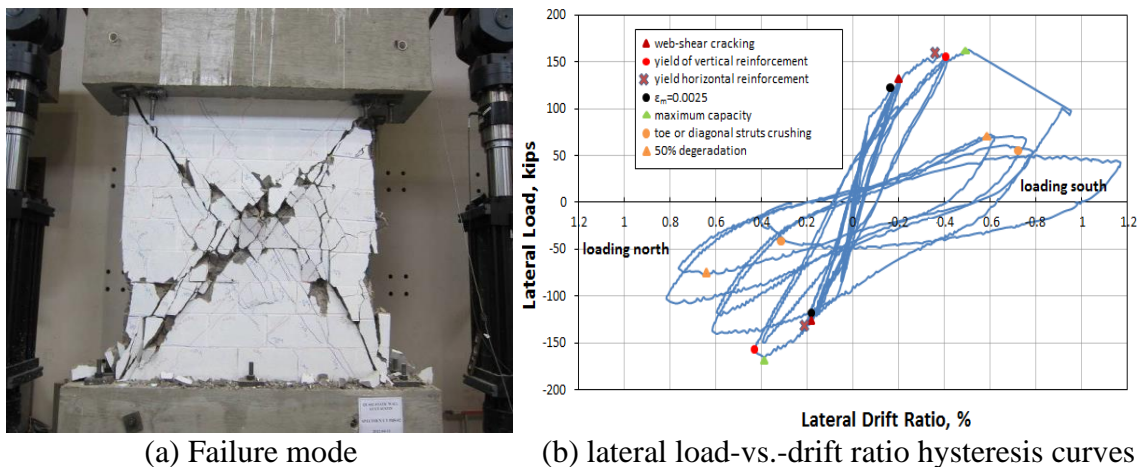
A shear-dominated RM wall (UT-PBS-02 tested by Ahmadi, 2012)
